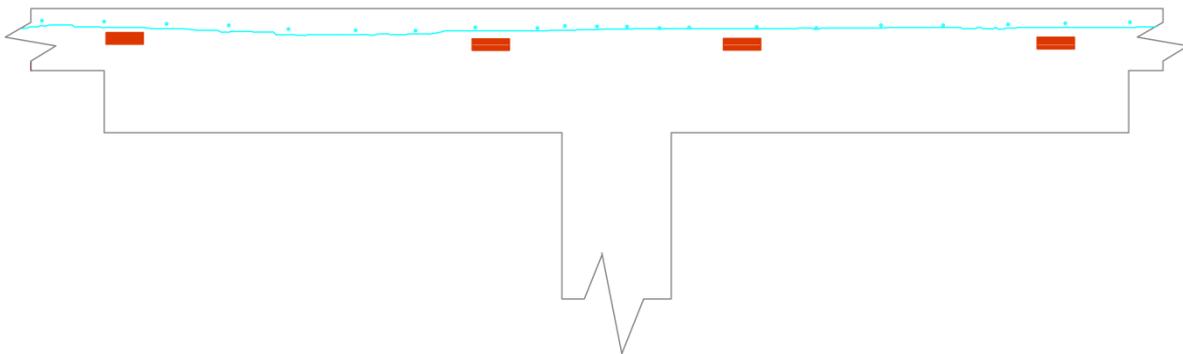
Cross Section through the slab and dropdown panel, showing position of PT Ducts and reinforcement
